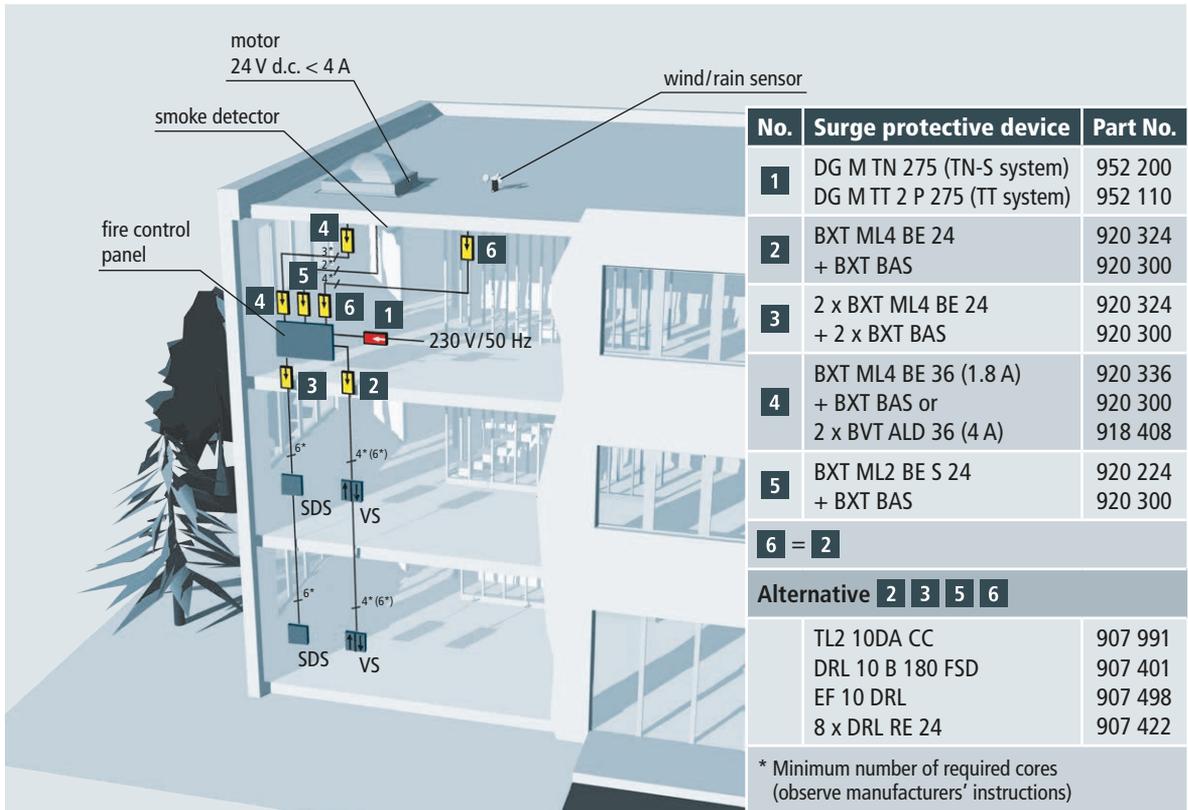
Domelight located on a non-metal roof of a structure without external lightning protection system
